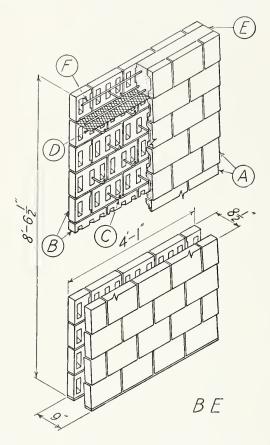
Faur-foot wall specimen BE, having 12 courses.
